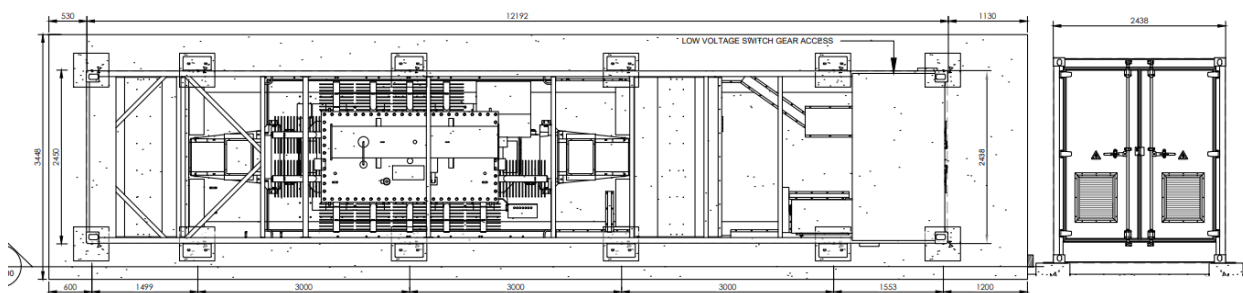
Inverter Floor Plan & End Elevation (Source: EDP Renewables)
